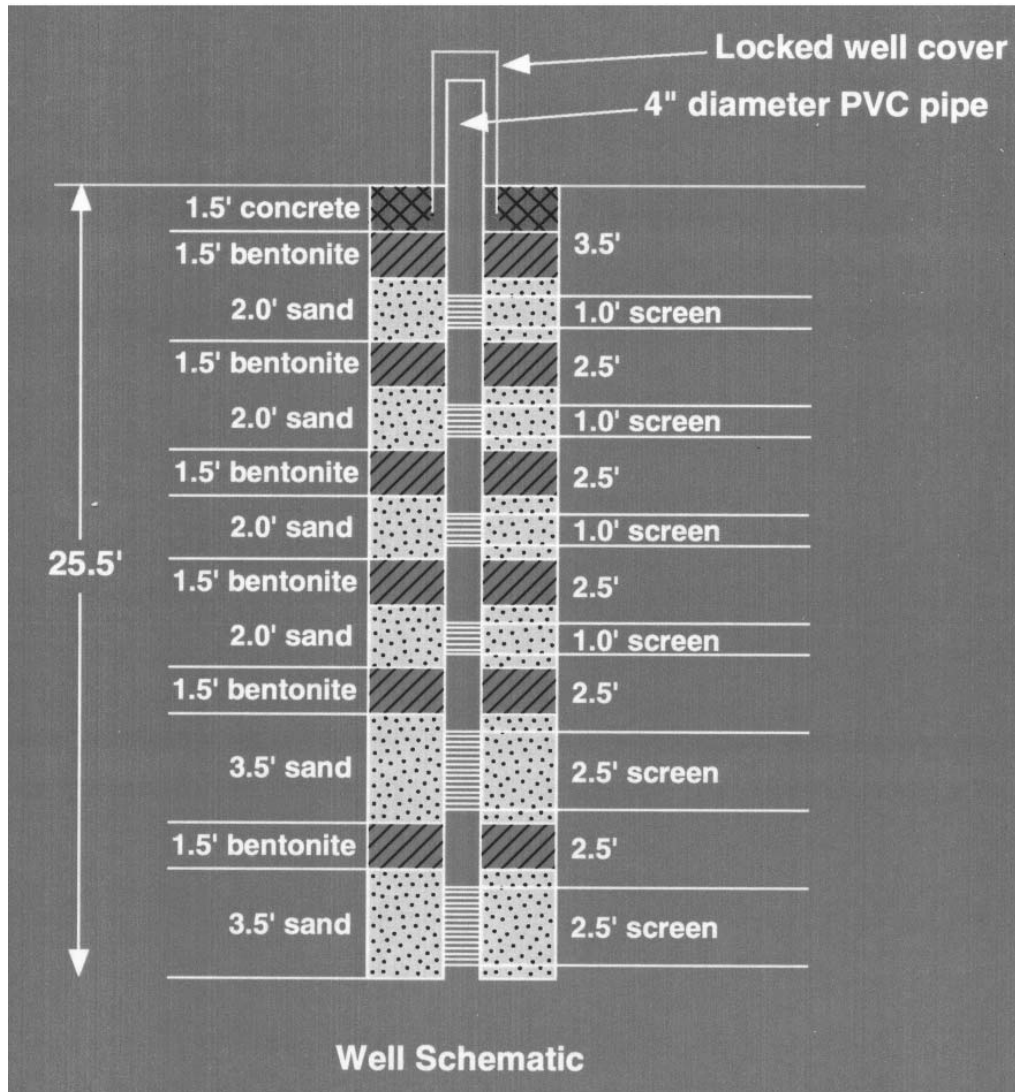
Typical well installation details for MWE wells installed at the Picillo Farm Superfund site.
